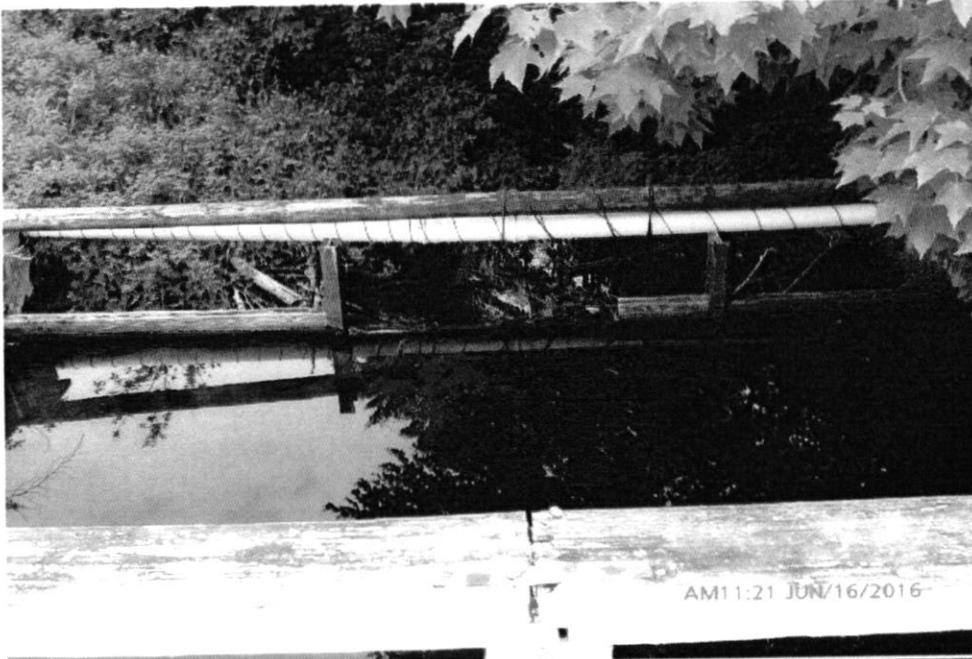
Dam ID# 162-1283 Paramount Pond Dam 06/16/2016
